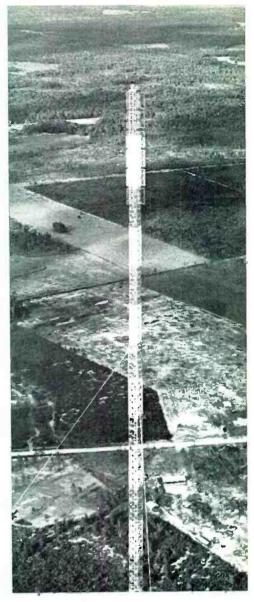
(above) Aerial view of completed tower and transmitter building.
